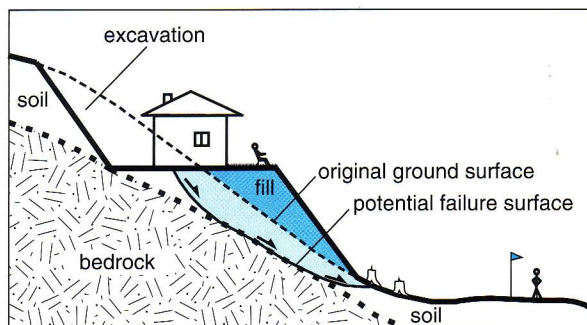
Diagram of a house built on a landslide-prone hillside, constructed with questionable practices. The soil upslope from the house was excavated leaving a steep soil face. This soil was placed as fill on top of existing soil to create a building lot (pad). Vegetation was removed from the slope, and surface water might pond on the lot. A potential failure surface is shown below the house.
